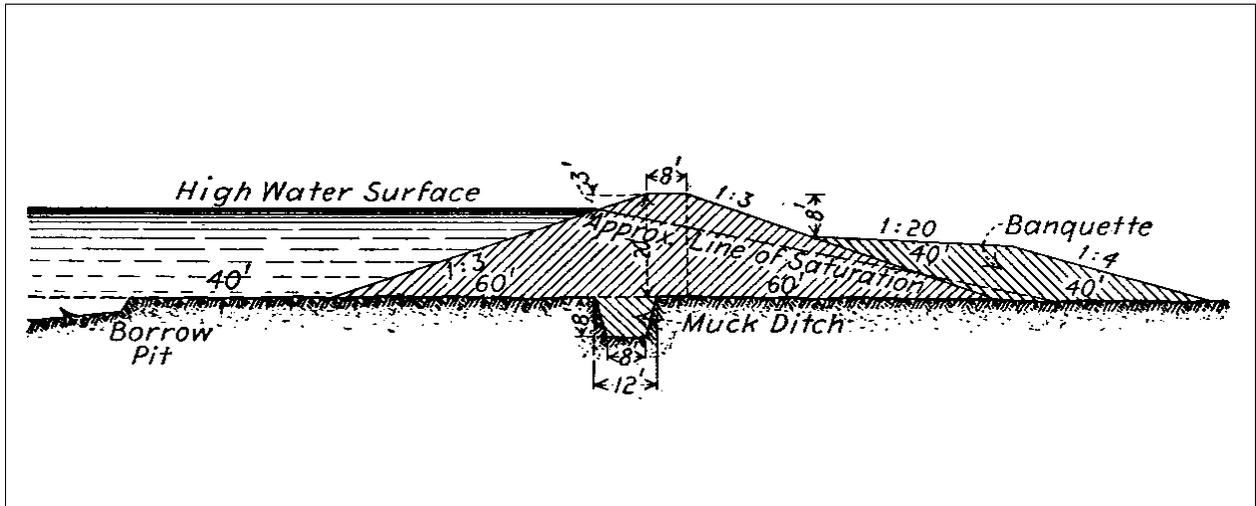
A Typical Levee Section Source: Van Ornum, 1914
